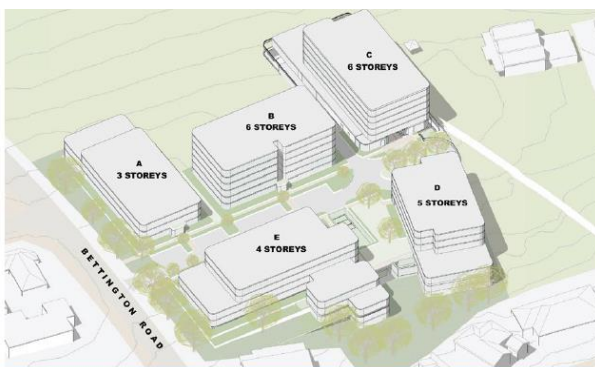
Indicative Built Form - Site Compatibility Certificate (Source: Architectural Drawings, Site Compatibility Certificate, Mirvac Design 26 October 2021)
